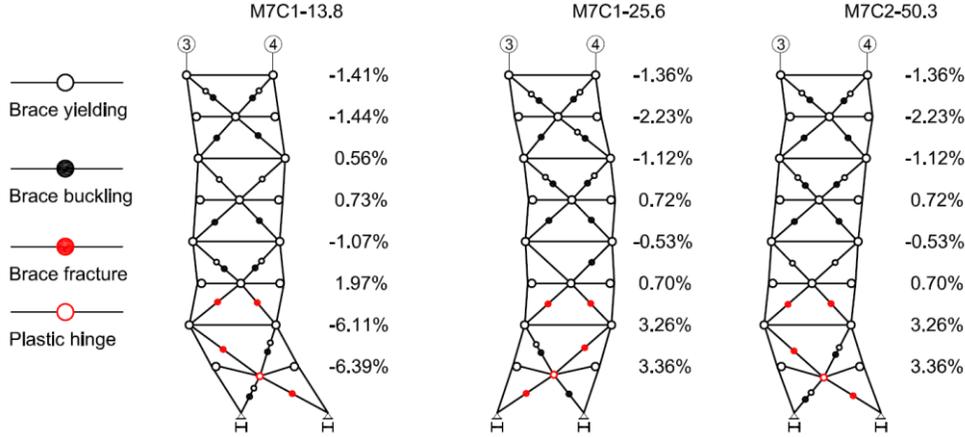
Failure mode of the studied 8-storey MD-CBF building
